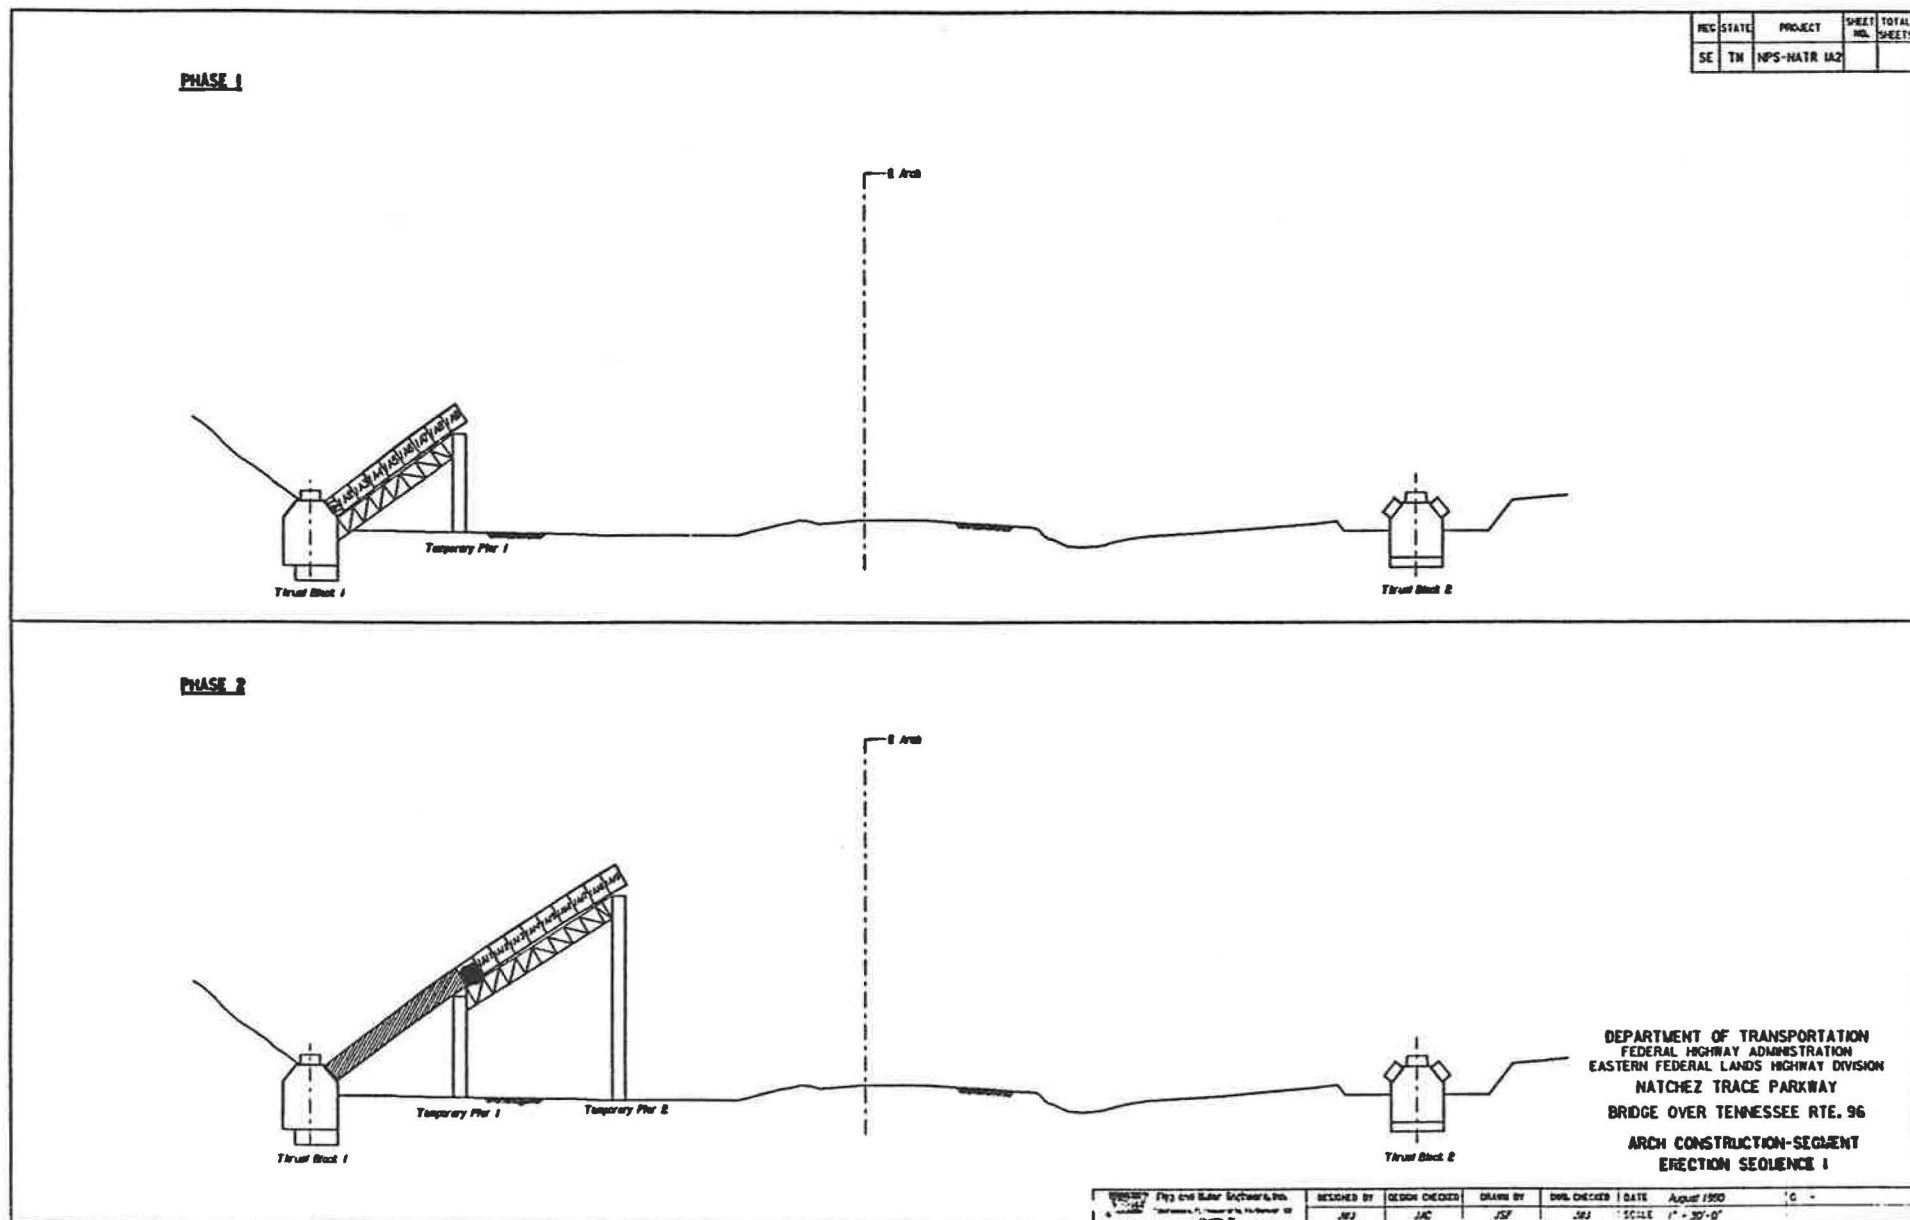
Arch construction - precast alternate - phases 1 and 2
